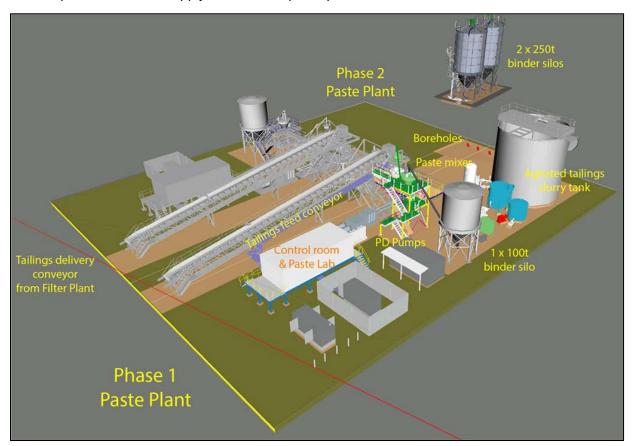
Isometric render View of the Phase 1 and 2 Paste Fill Plants and Binder Silos
